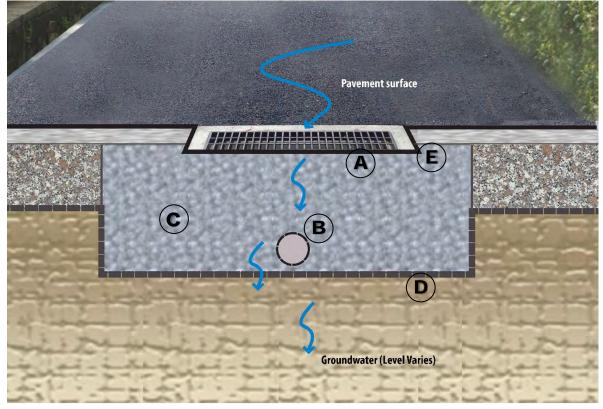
Infiltration Trench Schematic Inlet conveyance to aggregate storage under conventional pavement.
